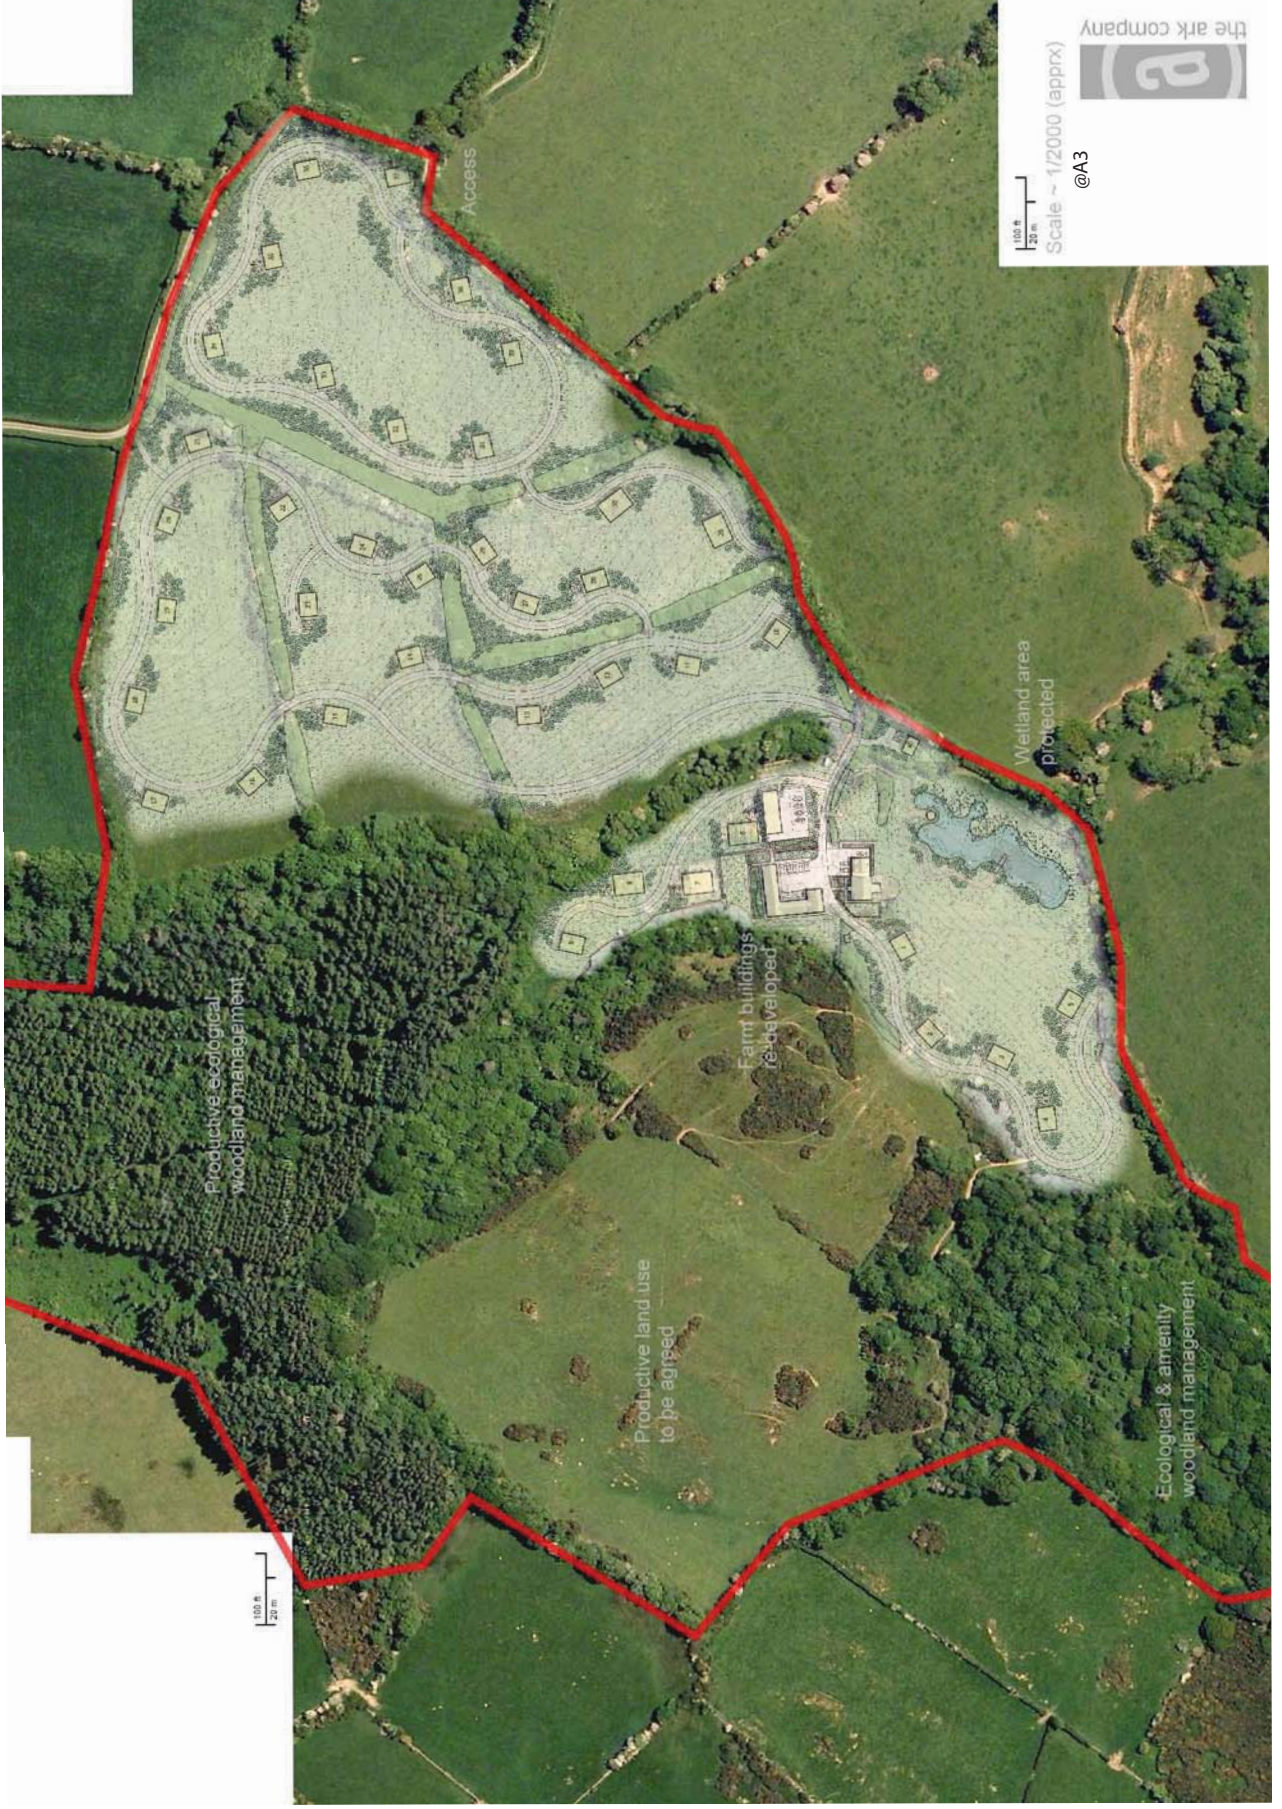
Development Proposal Plan (Ark Company Drawing)
